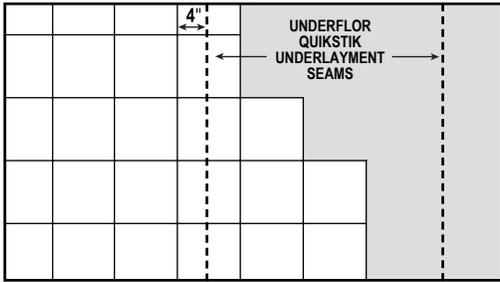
Position QuikStik Underflor seams at least 4" away from tile joints.
